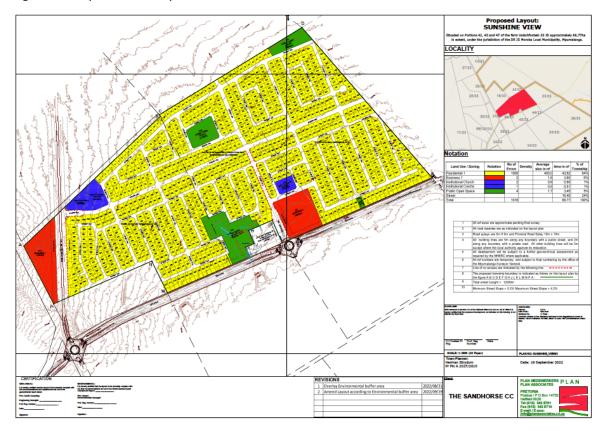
Layout Plan - Layout Alternative 2 (Preferred Alternative)
